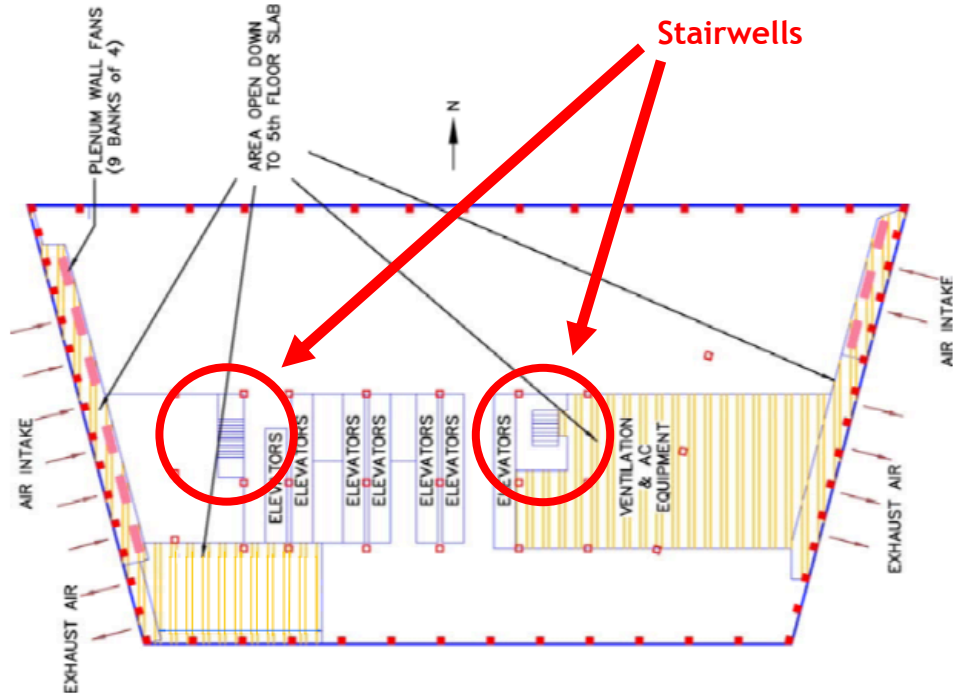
Schematic of Floor 6.<sup>1</sup>
